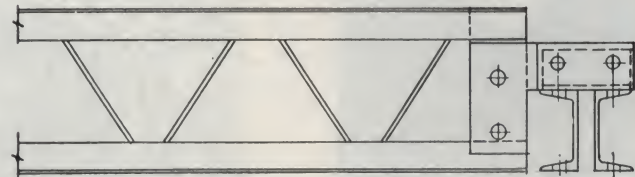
Mac-Mar Junior Trusses Are Optional for Floor Joists
